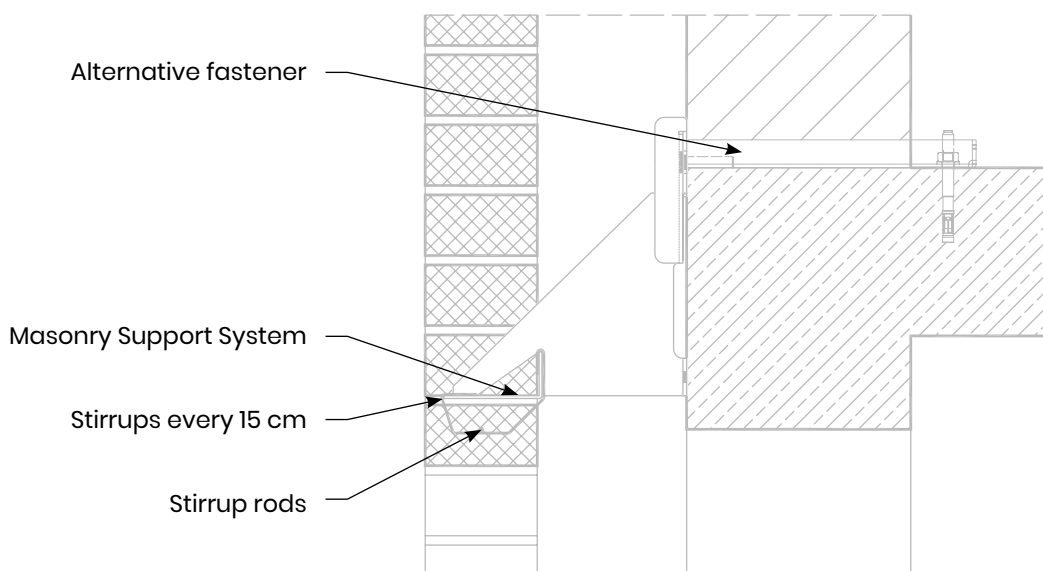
1 NA Masonry Support System + MZ Fastener
